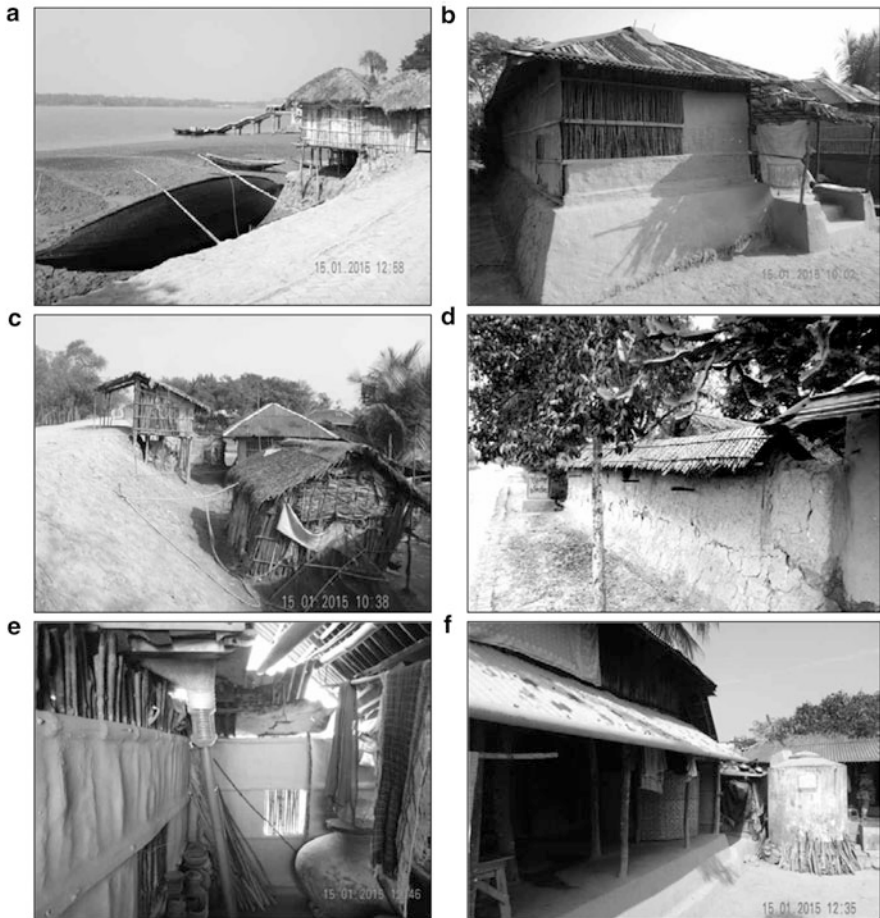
Examples of grassroots technologies observed in Gabura. (a) Tying down boats to secure from storm surge; (b) Raised plinth height of the houses; (c) Tethering to secure house roofs; (d) Protection of mud walls from rainfall; (e) Plumbing modified to allow upstairs toilet during flooding; and, (f) Tanks for rainwater harvesting as drinking purpose
